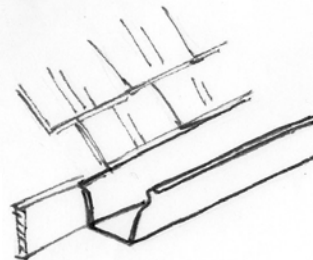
Half-round hanging gutters should be used on historic buildings, not ogee gutters.
